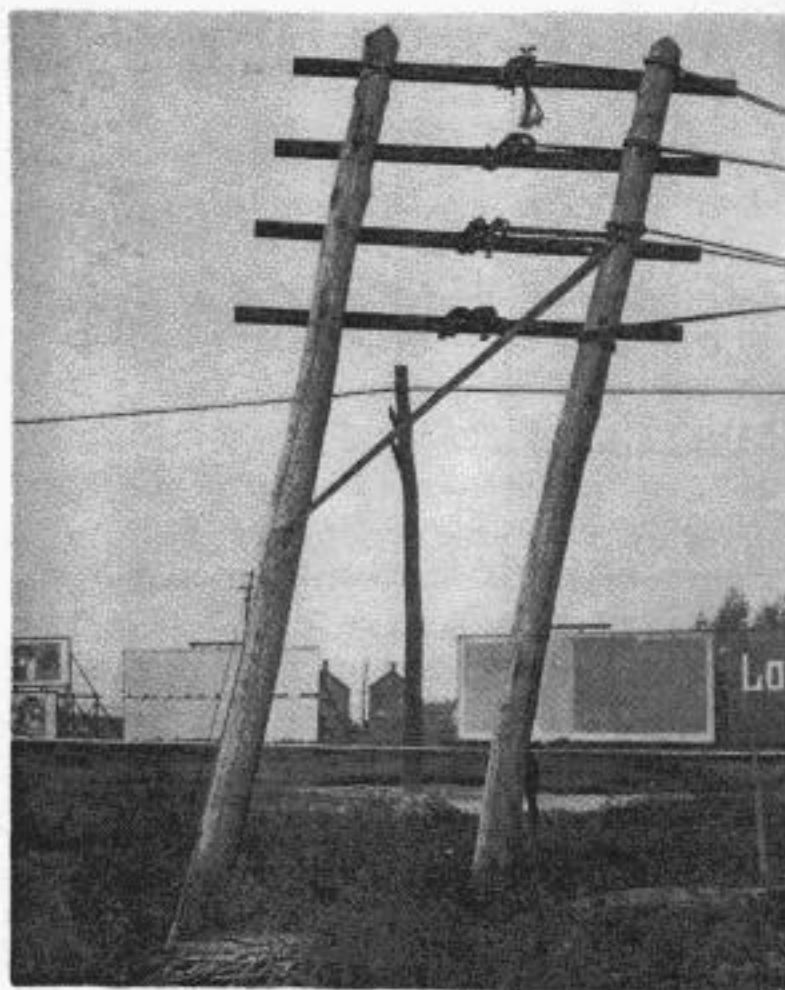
Same fixture as Figure 4 under 10,000-lb. load after $\frac{3}{4}$ -in. bolt replaced sheared $\frac{5}{8}$ -in. bolt
